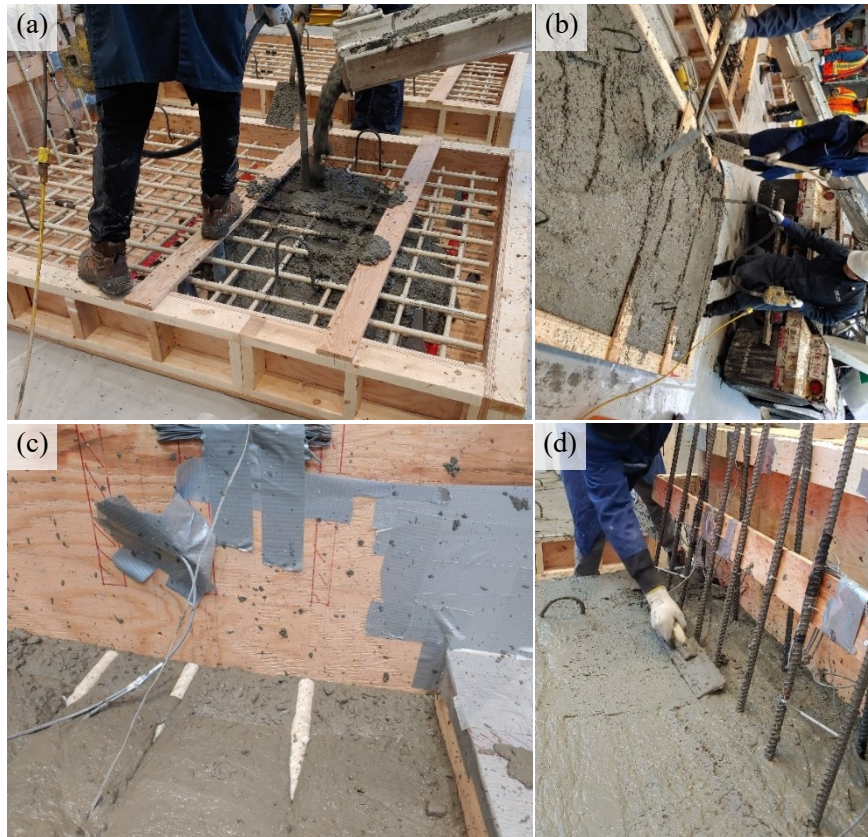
Concrete pour process for first fabrication stage (a) Concrete casted into SP-02 while being vibrated, (b) Concrete spread with shovel, (c) Concrete vibrated and distributed, and (d) Final surface detailing with trowel.
